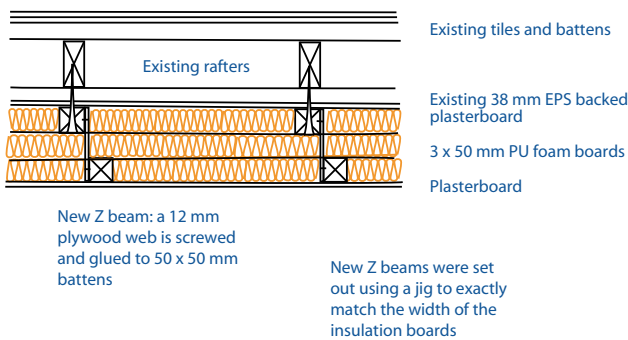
Z rafters fixed beneath the existing roof to support the insulation
